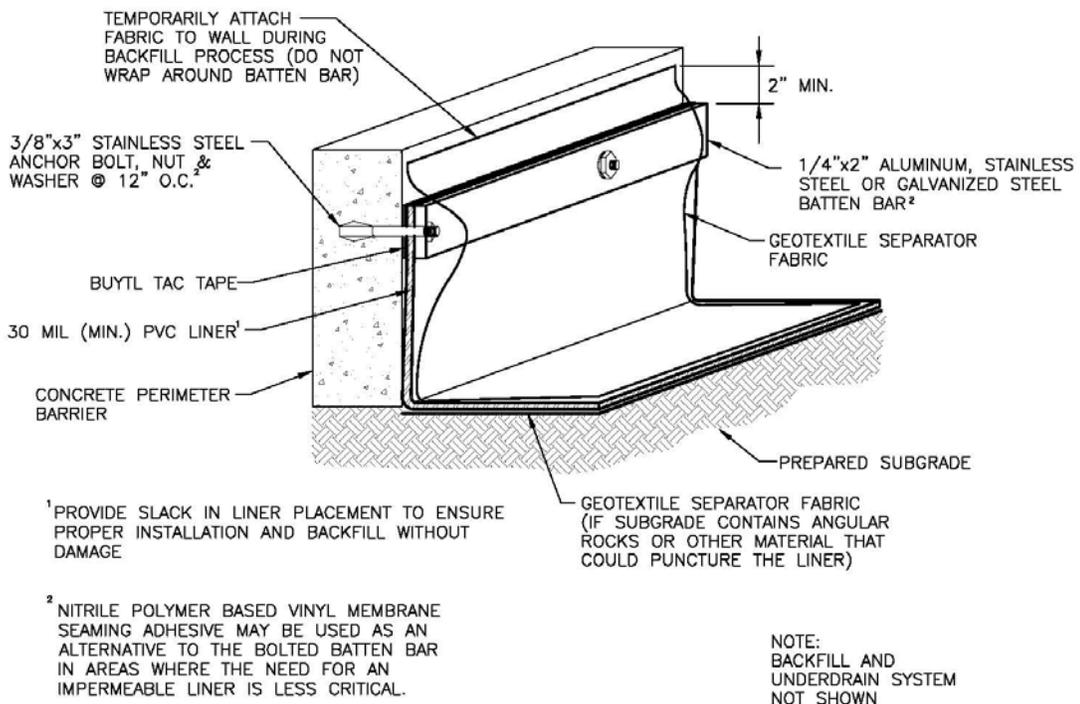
Geomembrane Liner/Concrete Connection Detail
